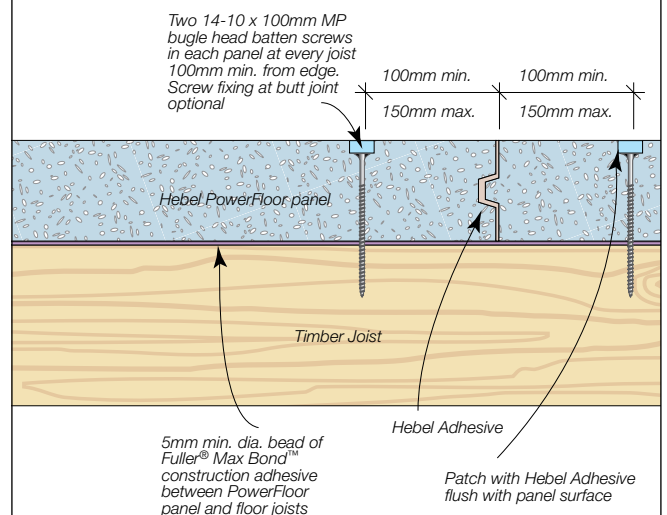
Cross-section of Hebel PowerFloor Panel Installation
